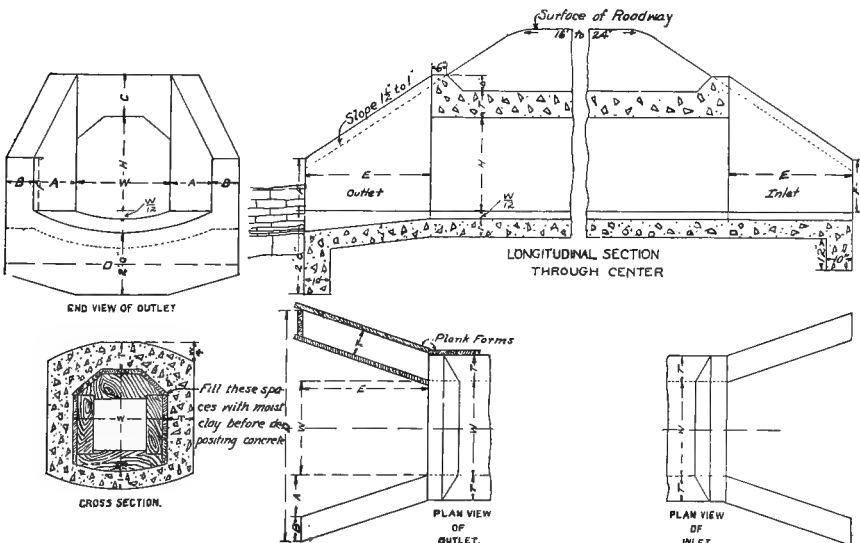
Concrete Culverts designed by the Minnesota State Highway Commission.
